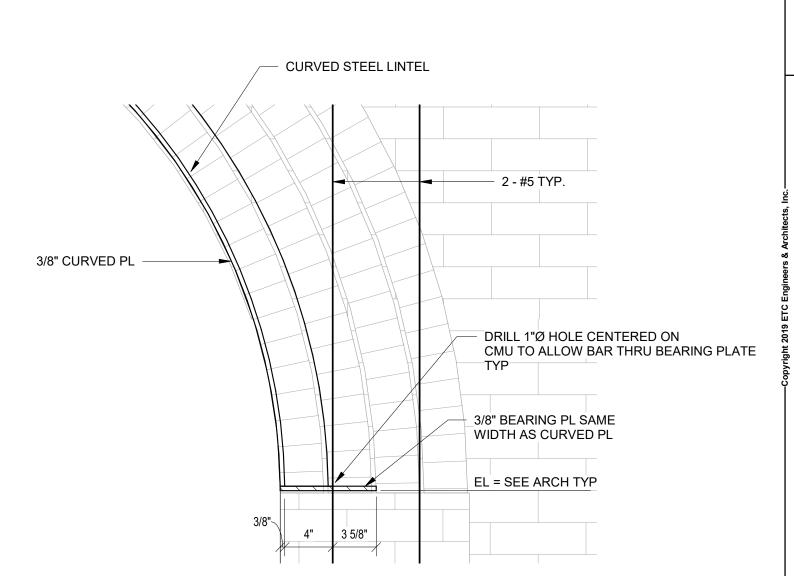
DETAIL - ADDITIONAL REINF @ ARCHED OPENING
